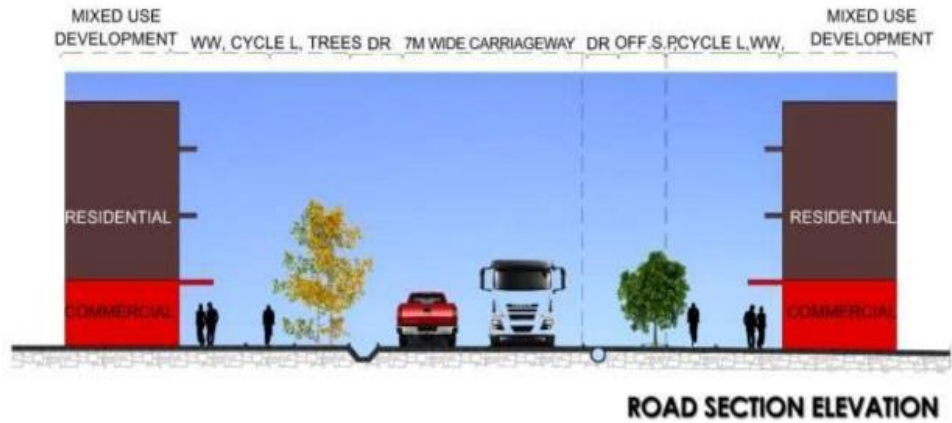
Proposed Ngong' CBD Improvement Plan
